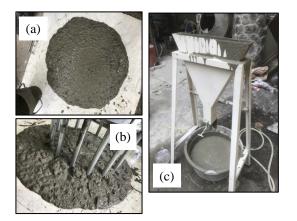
Fresh concrete test (a) Slump flow (b) J-Ring (c) V-funnel
